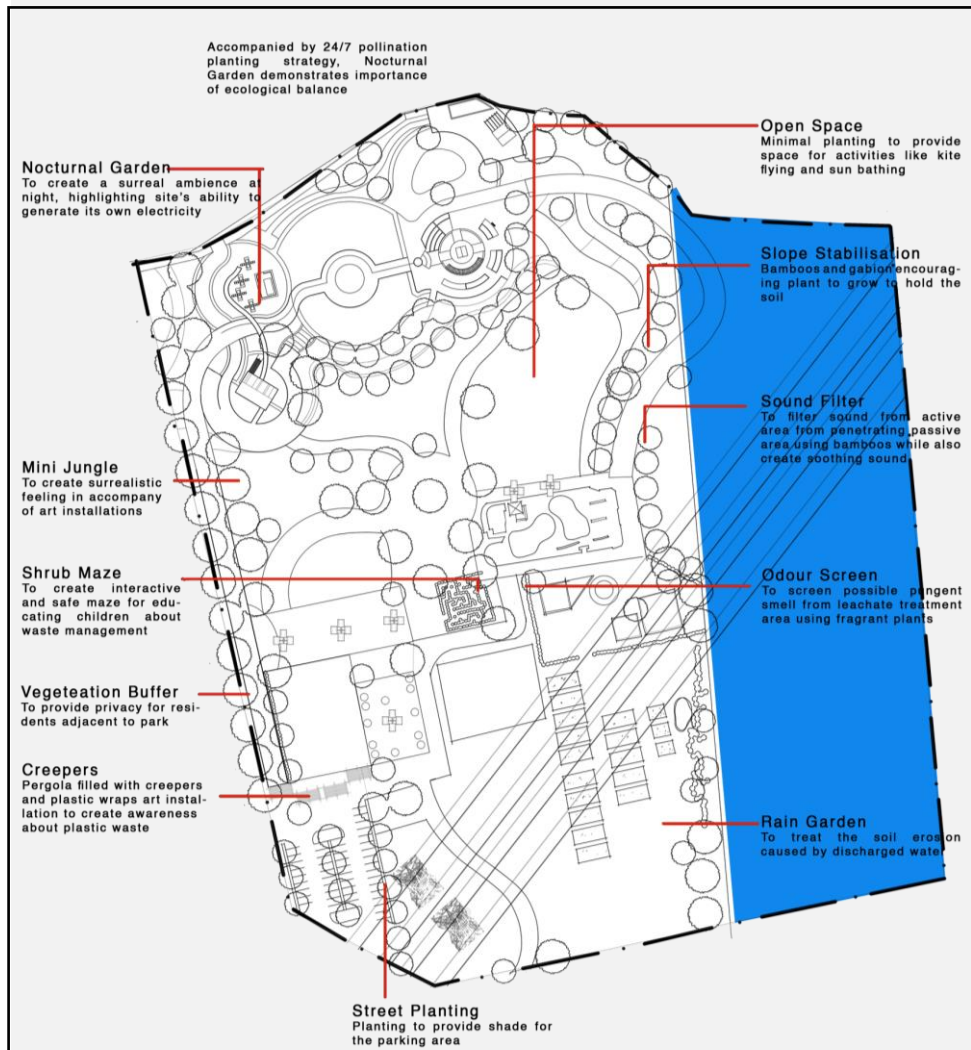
Plans for planting concept and schematic in scale 1:1500 on A0-size paper
